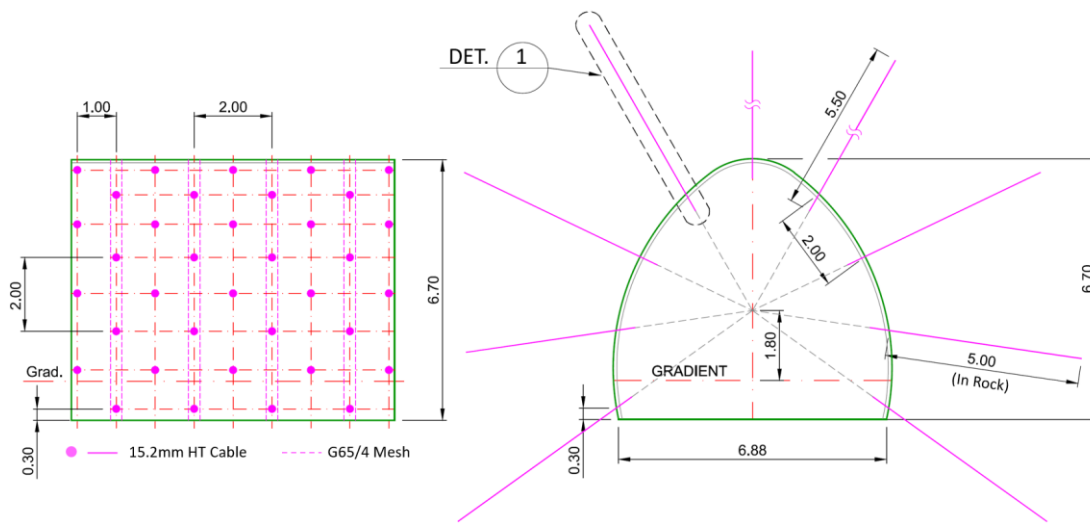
Secondary ground support layer, reinforcement pattern and surface support.
